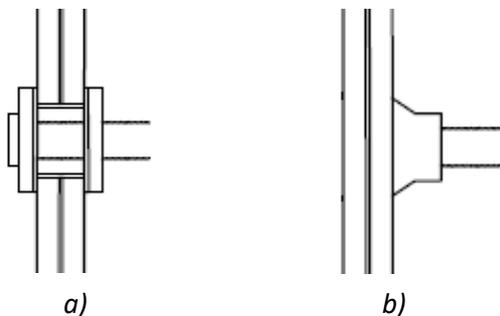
Mechanical bolt (a) and adhesive (b) point connections
